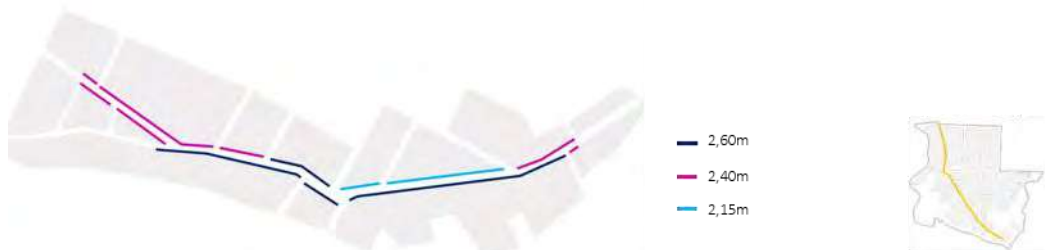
Sidewalks widths proposal - Eleuterio Fernandes de Andrade Ave.
